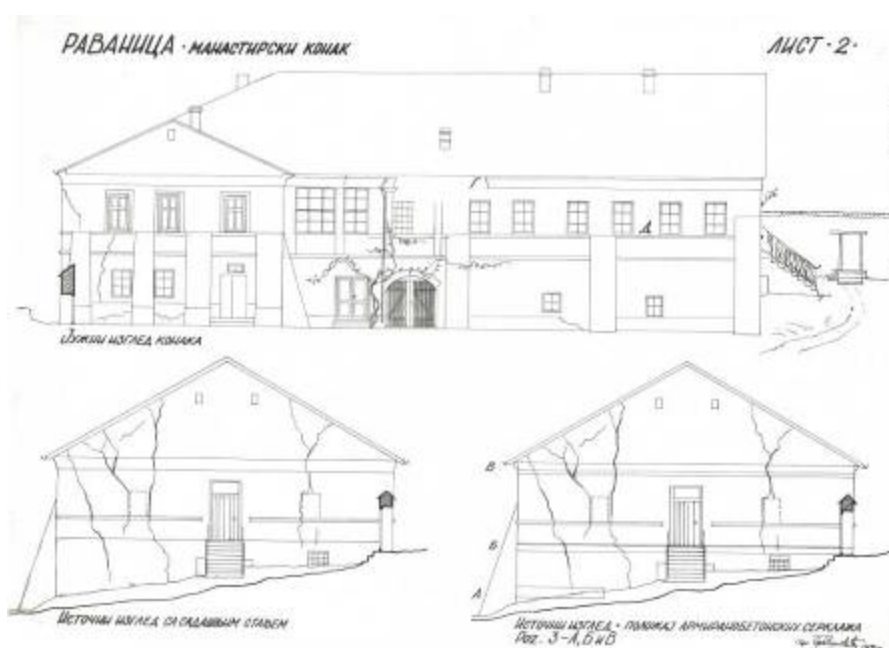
Dionisije's building - above the original walls of basement (XIV c.) first floor was added in 1852. south and east elevations in 1959., before static repairing
